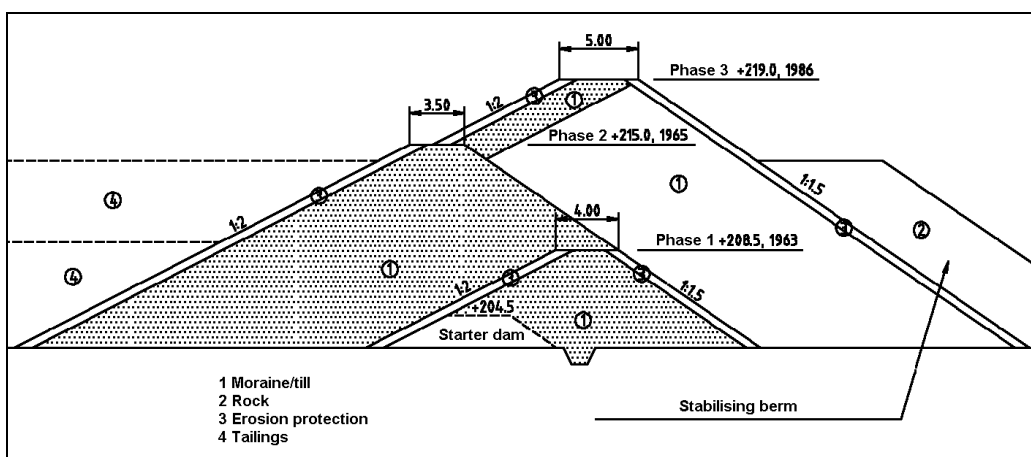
Cross-section of dam at Garpenberg before latest raise
